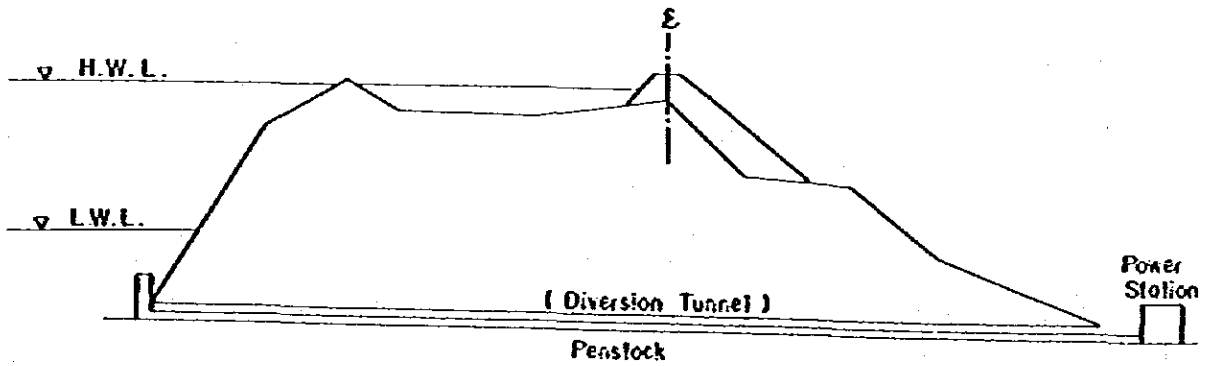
SCHEMATIC DIAGRAM OF ALTERNATIVE WATERWAY PLANS
